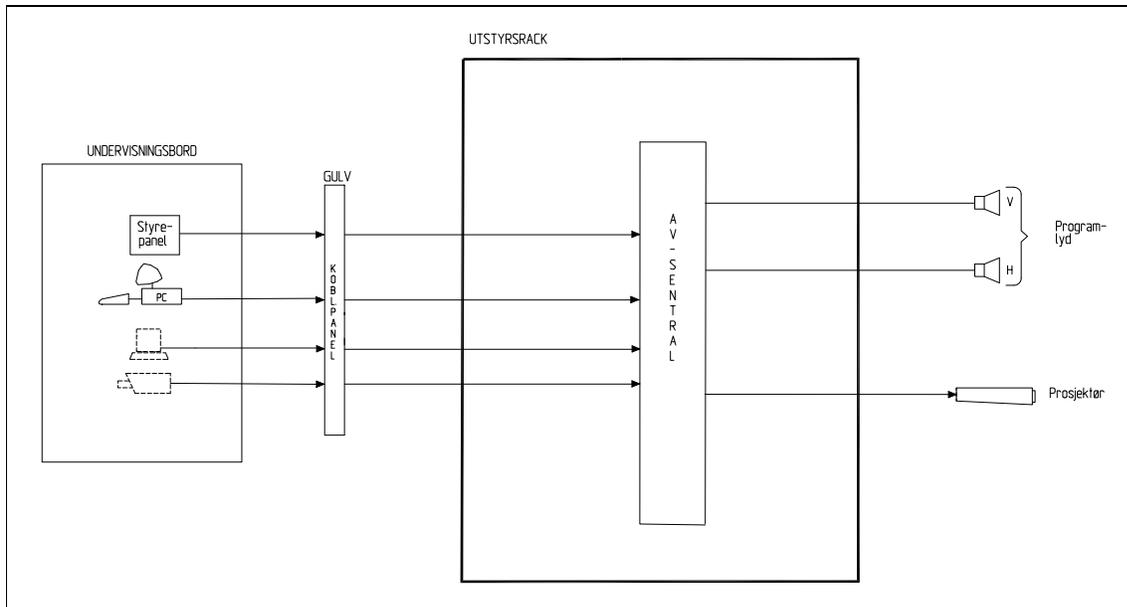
Principle drawing of the AV system in a simple seminar room with the central equipment in a rack and connections through a floor box.
